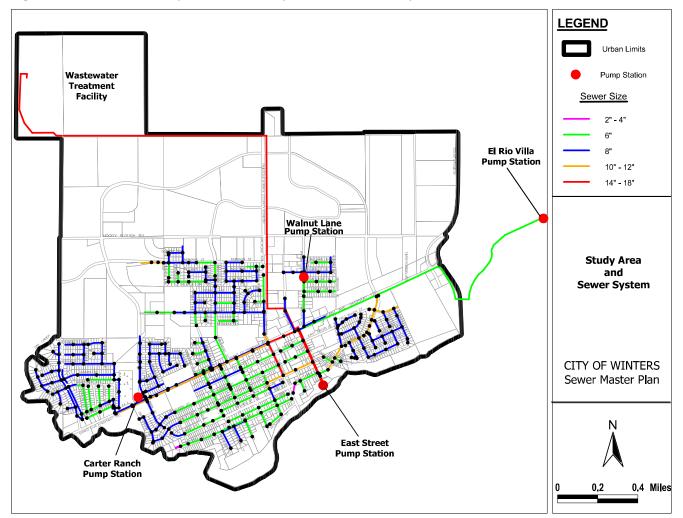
Master Plan Study Area and the City's Sewer Collection System
